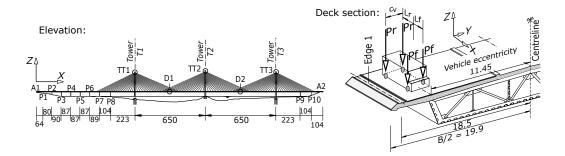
Elevation and deck cross-section of the Queensferry cable-stayed bridge (CSB). Dimensions in meters.
